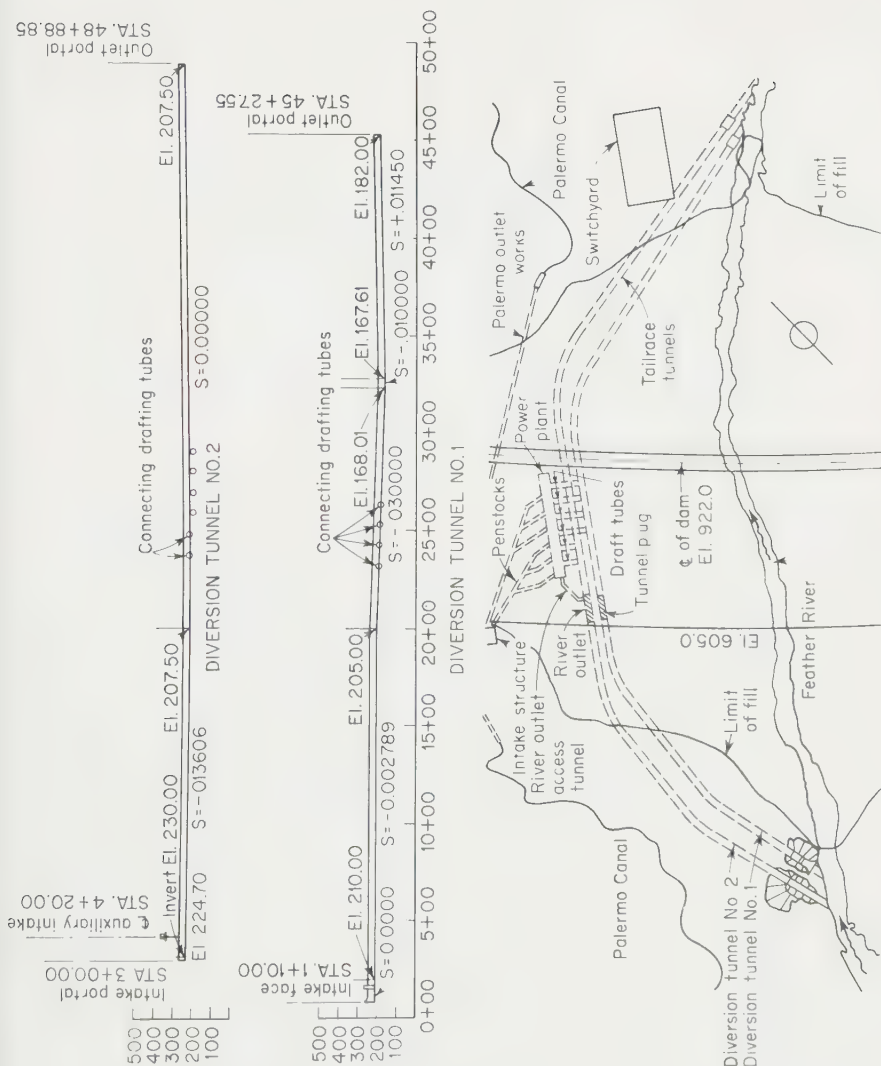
Plan and profile of Oroville Dam diversion tunnels.
